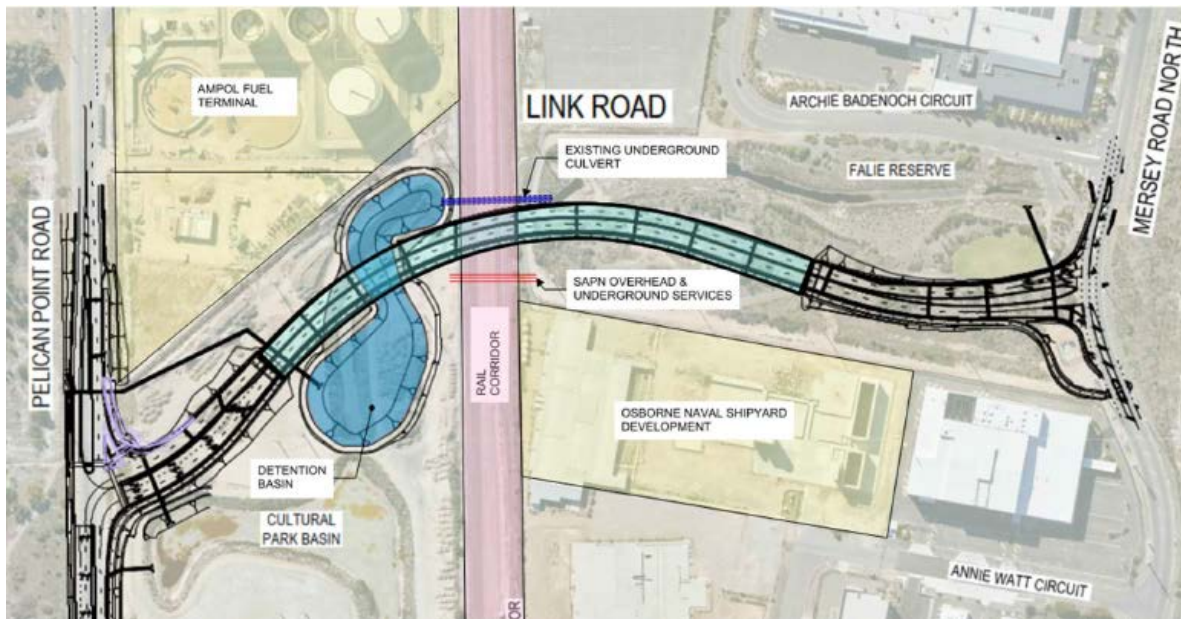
Site Constraints around Eurimbla Way Bridge
